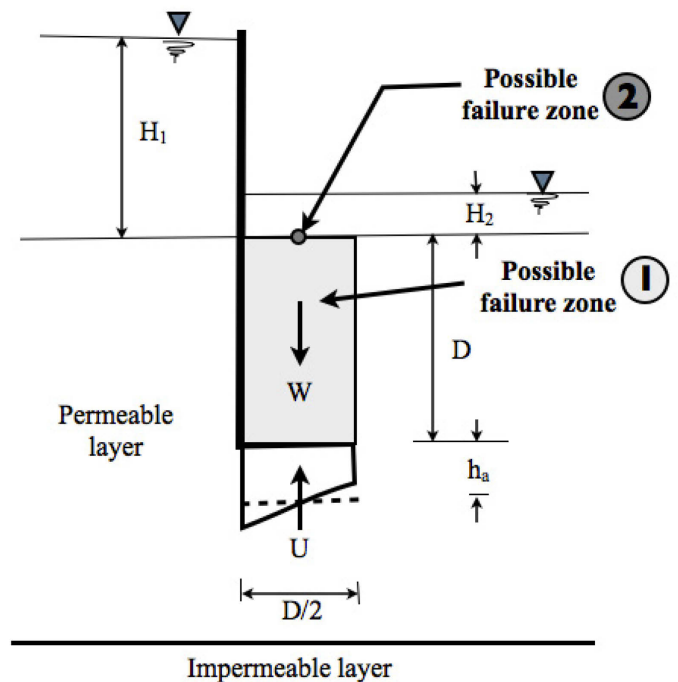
Terzaghi's hydraulic heave model for a single row sheet pile structure. The possible failure zones for heave (1) and for the initiation of piping (2) are shown.
